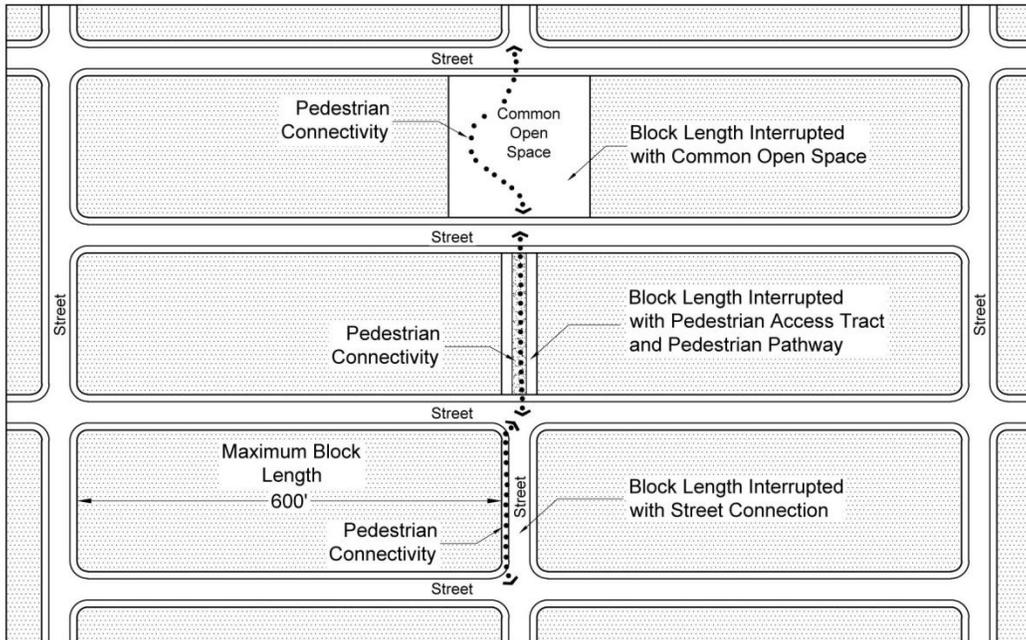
(a).3 – Site Layout – Block Length Standards
